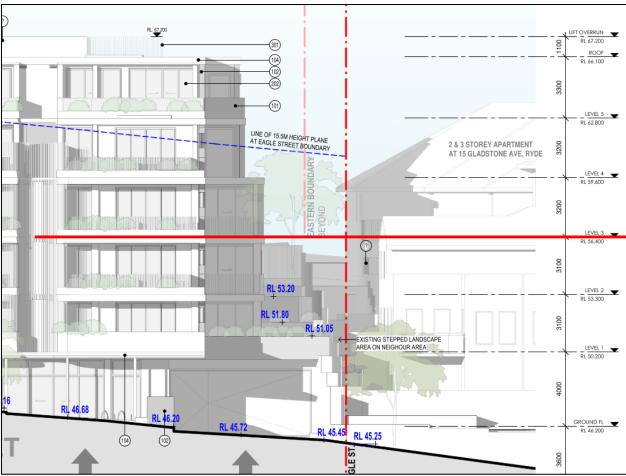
Front elevation plan showing Level 3, Level 4 and Level 5 aligning with the roof of the neighbouring property to the south east (No. 15-19 Gladstone Avenue)
